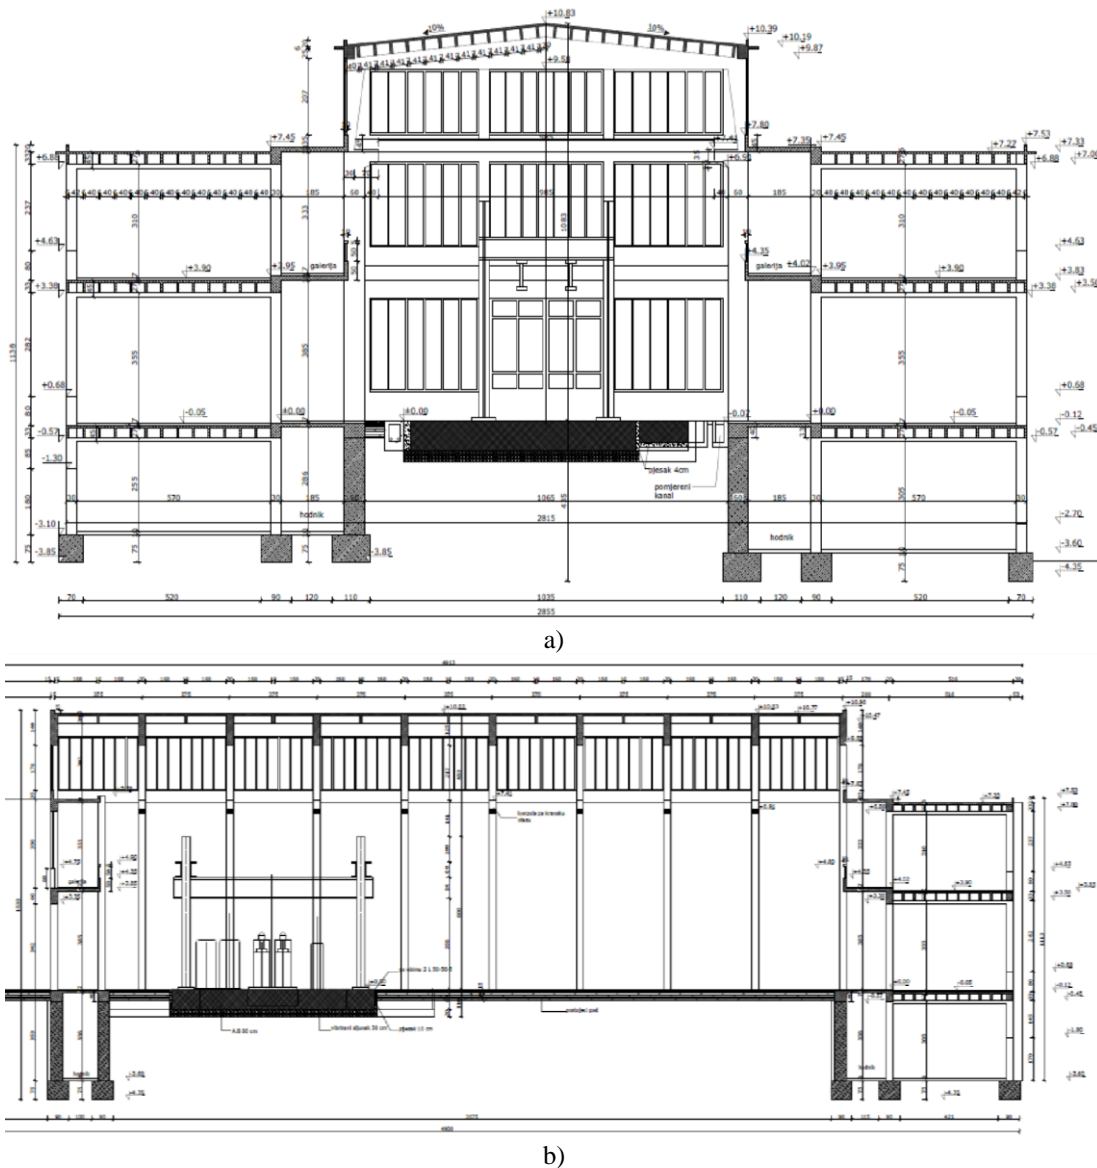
IMK building: a) cross-section; b) longitudinal section.
